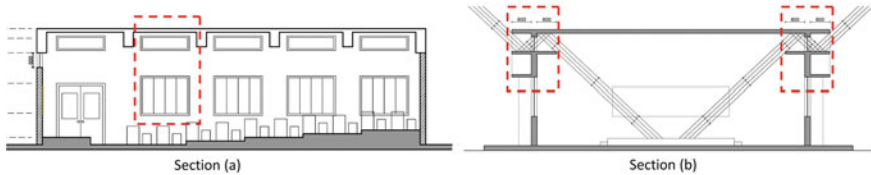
Proposed architectural interventions for retrofitting; section a—adding windows in bay one; section b—adding light shelf
